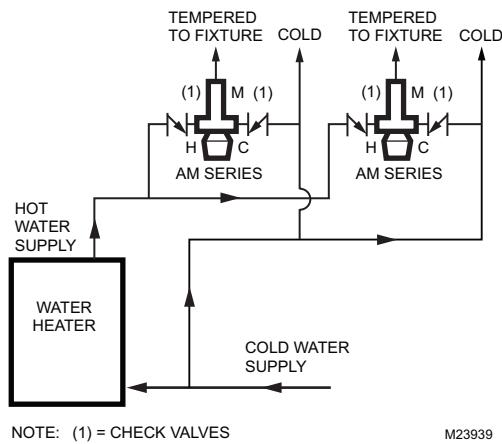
AM Series ASSE 1070 - Two Handle Fixtures.
